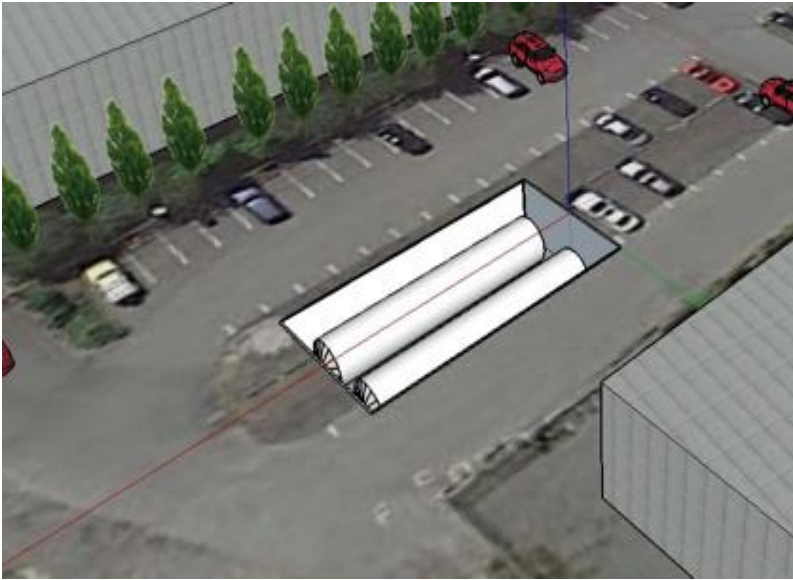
Underground Fiberglass Storage Tanks (Shoring Method)
